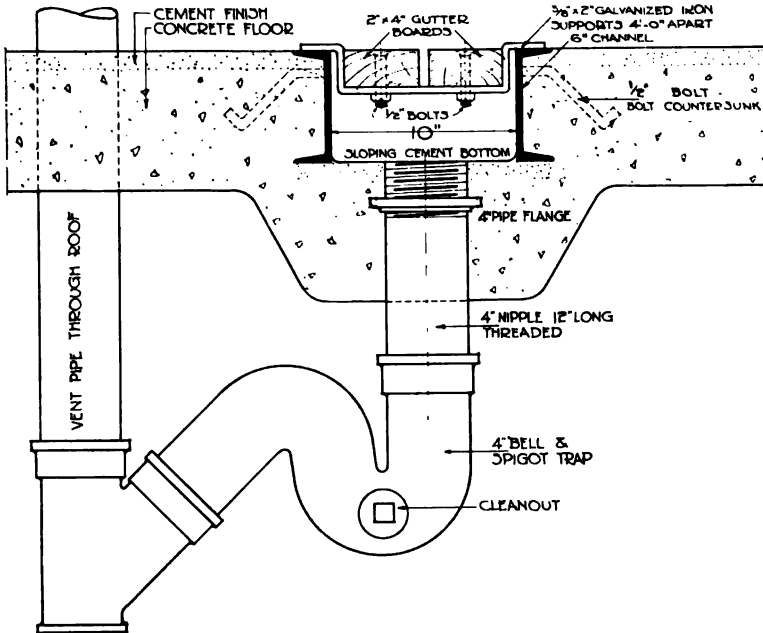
DETAIL OF GUTTER IN CONCRETE FLOOR.
